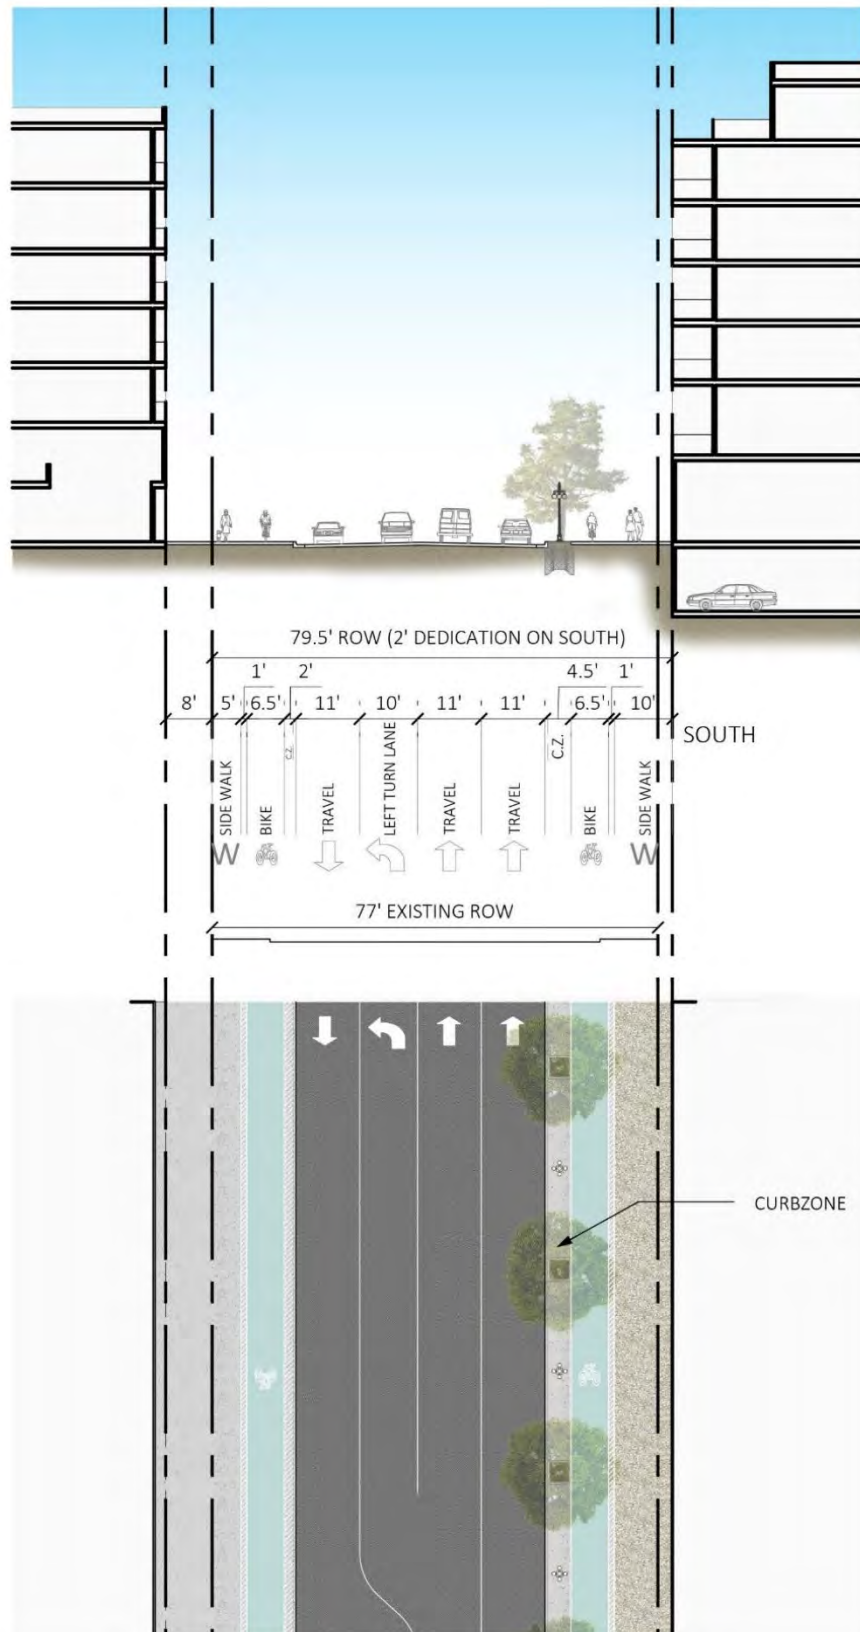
Front Street Between Laurel Street and Spruce Street (3)
